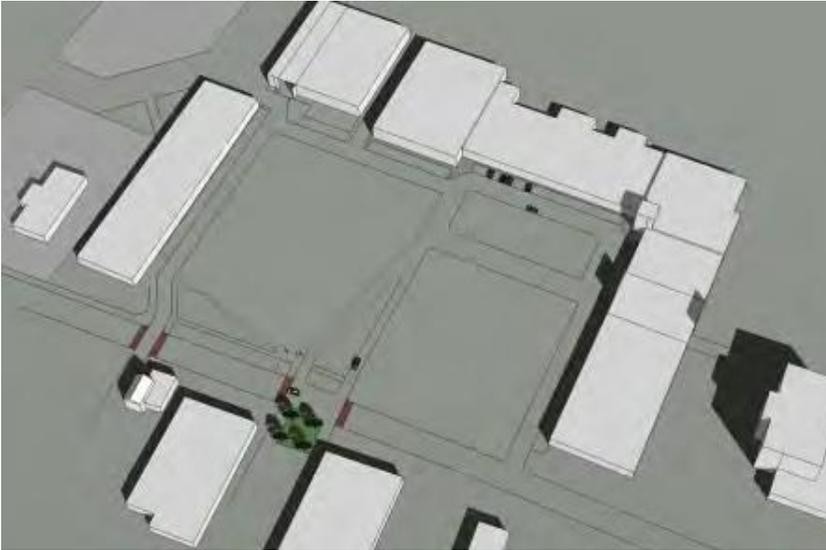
Shared curb cut and parking areas. Shared curb cuts and parking areas limit the number of driveways needed on busy streets, and help to reduce the amount of paved parking area.
